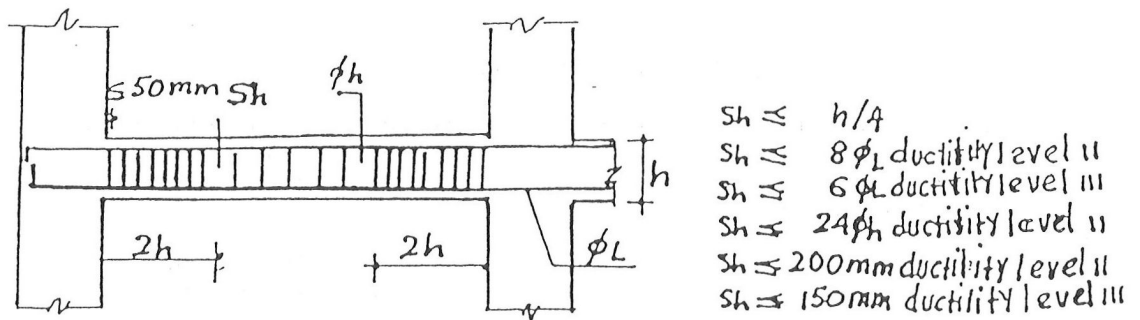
REGIONS AND SPACING OF TRANSVERSE REINFORCEMENT
